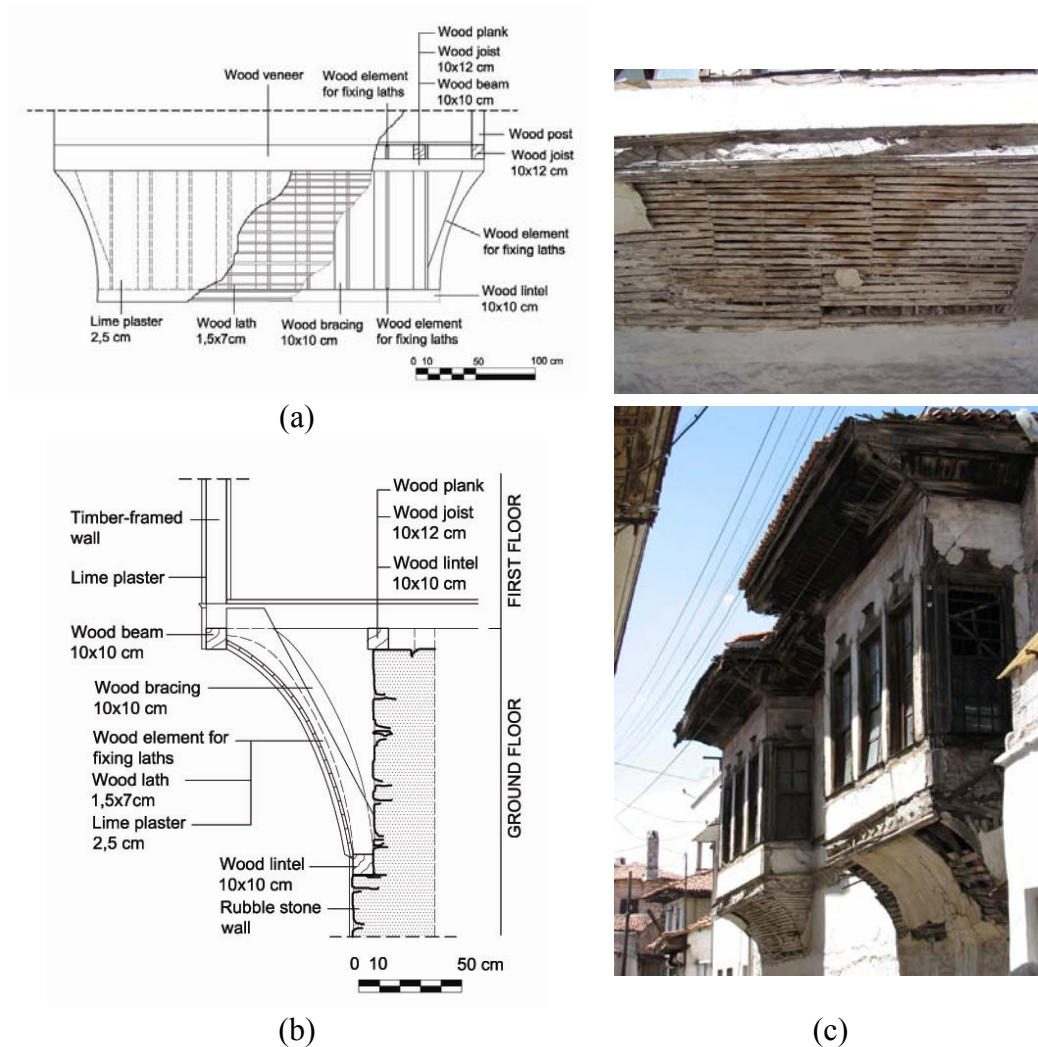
Partial elevation and section of the *cumba* supported with wooden bracings covered with plaster on laths (*bağdadi*); a. partial elevation, b. section, c. views from *cumba* (Sekibaşı St. No: 6)
